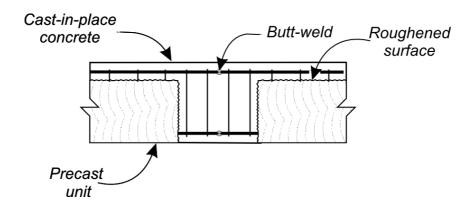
Beam-to-beam connection using welded bars
